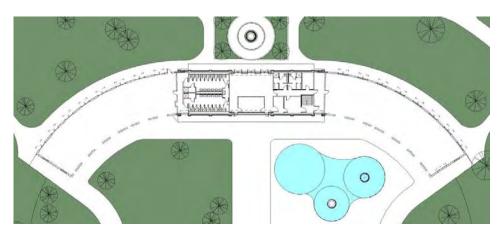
Option 2 plan showing doors and walls below existing windows removed. Openings are gated at park side.
